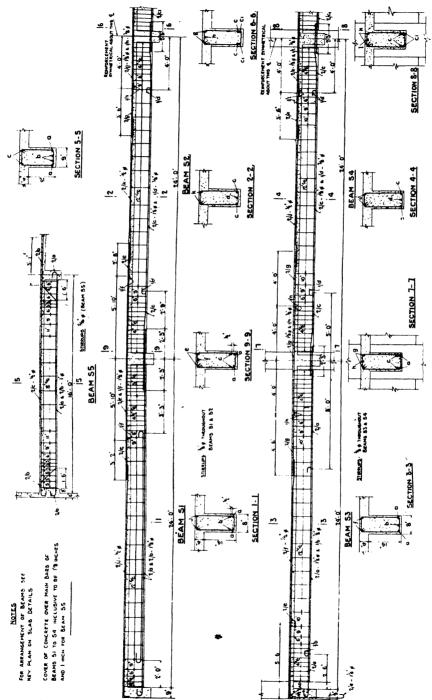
DETAILS OF FLOOR SECONDARY BEAMS.
